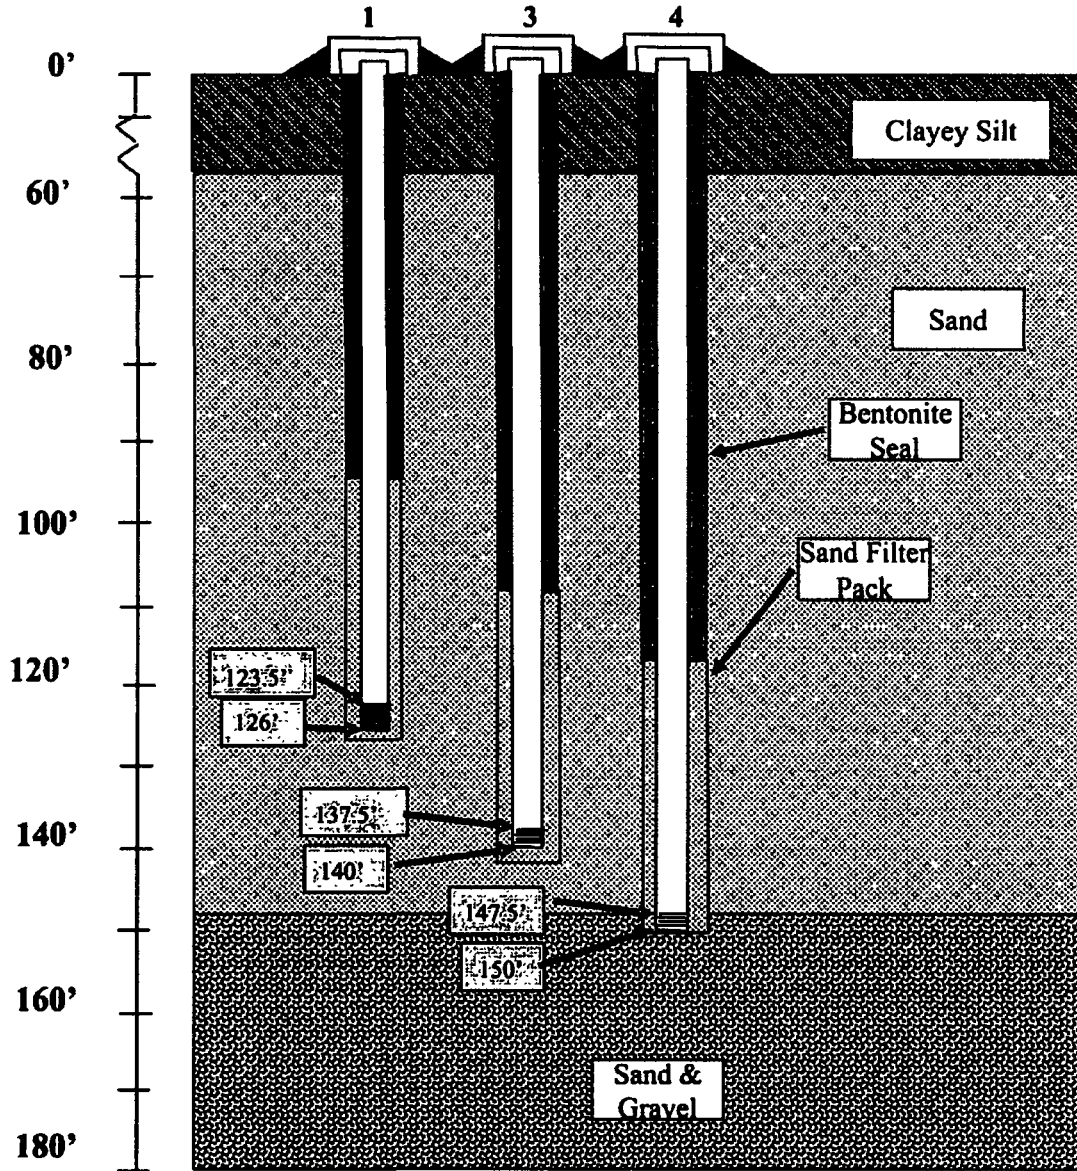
UN-A-1, UN-A-3 and UN-A-4 construction details. Installed in February 1997 by Liehs Drilling Inc., Lexington, NE using a hollow stem auger.
